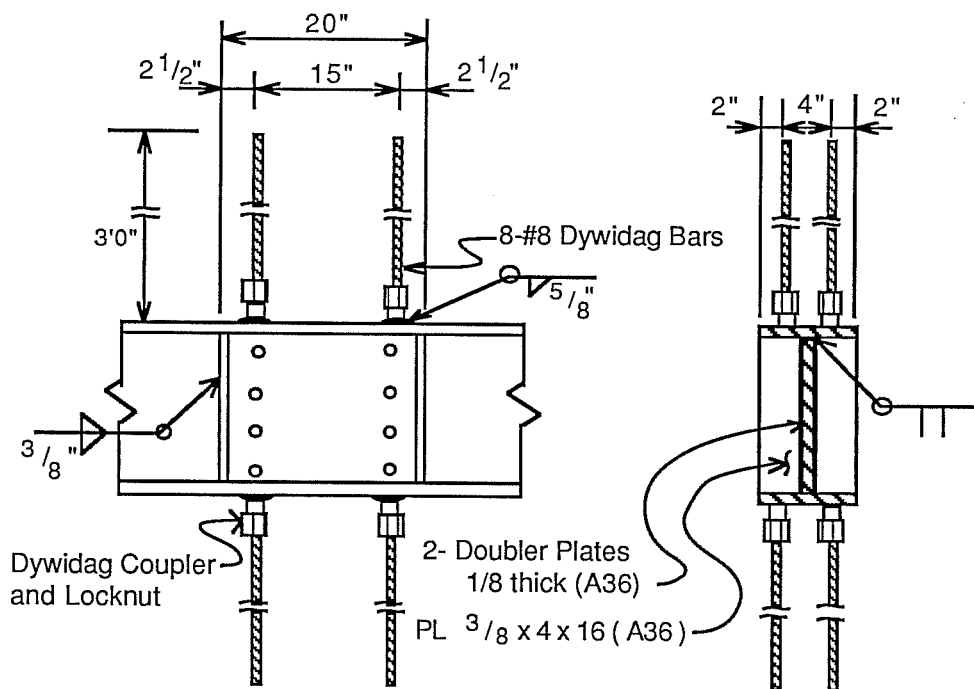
Specimen 11: Face Bearing Plates, Doubler Plates and Dywidag Bars
